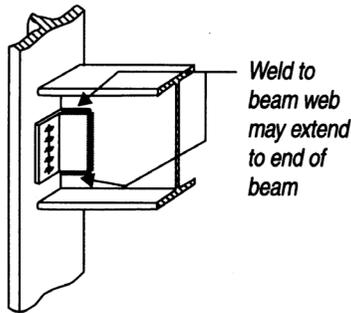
Fillet weld details on framing angles.
